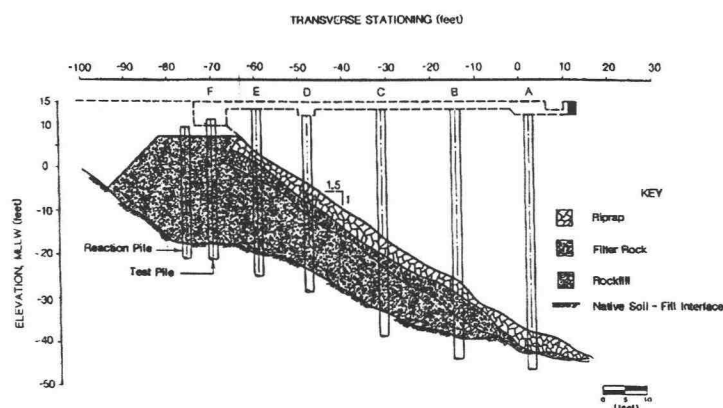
Wharf and actual slope cross-section for static lateral test in sloping ground (Diaz et al., 1984)
